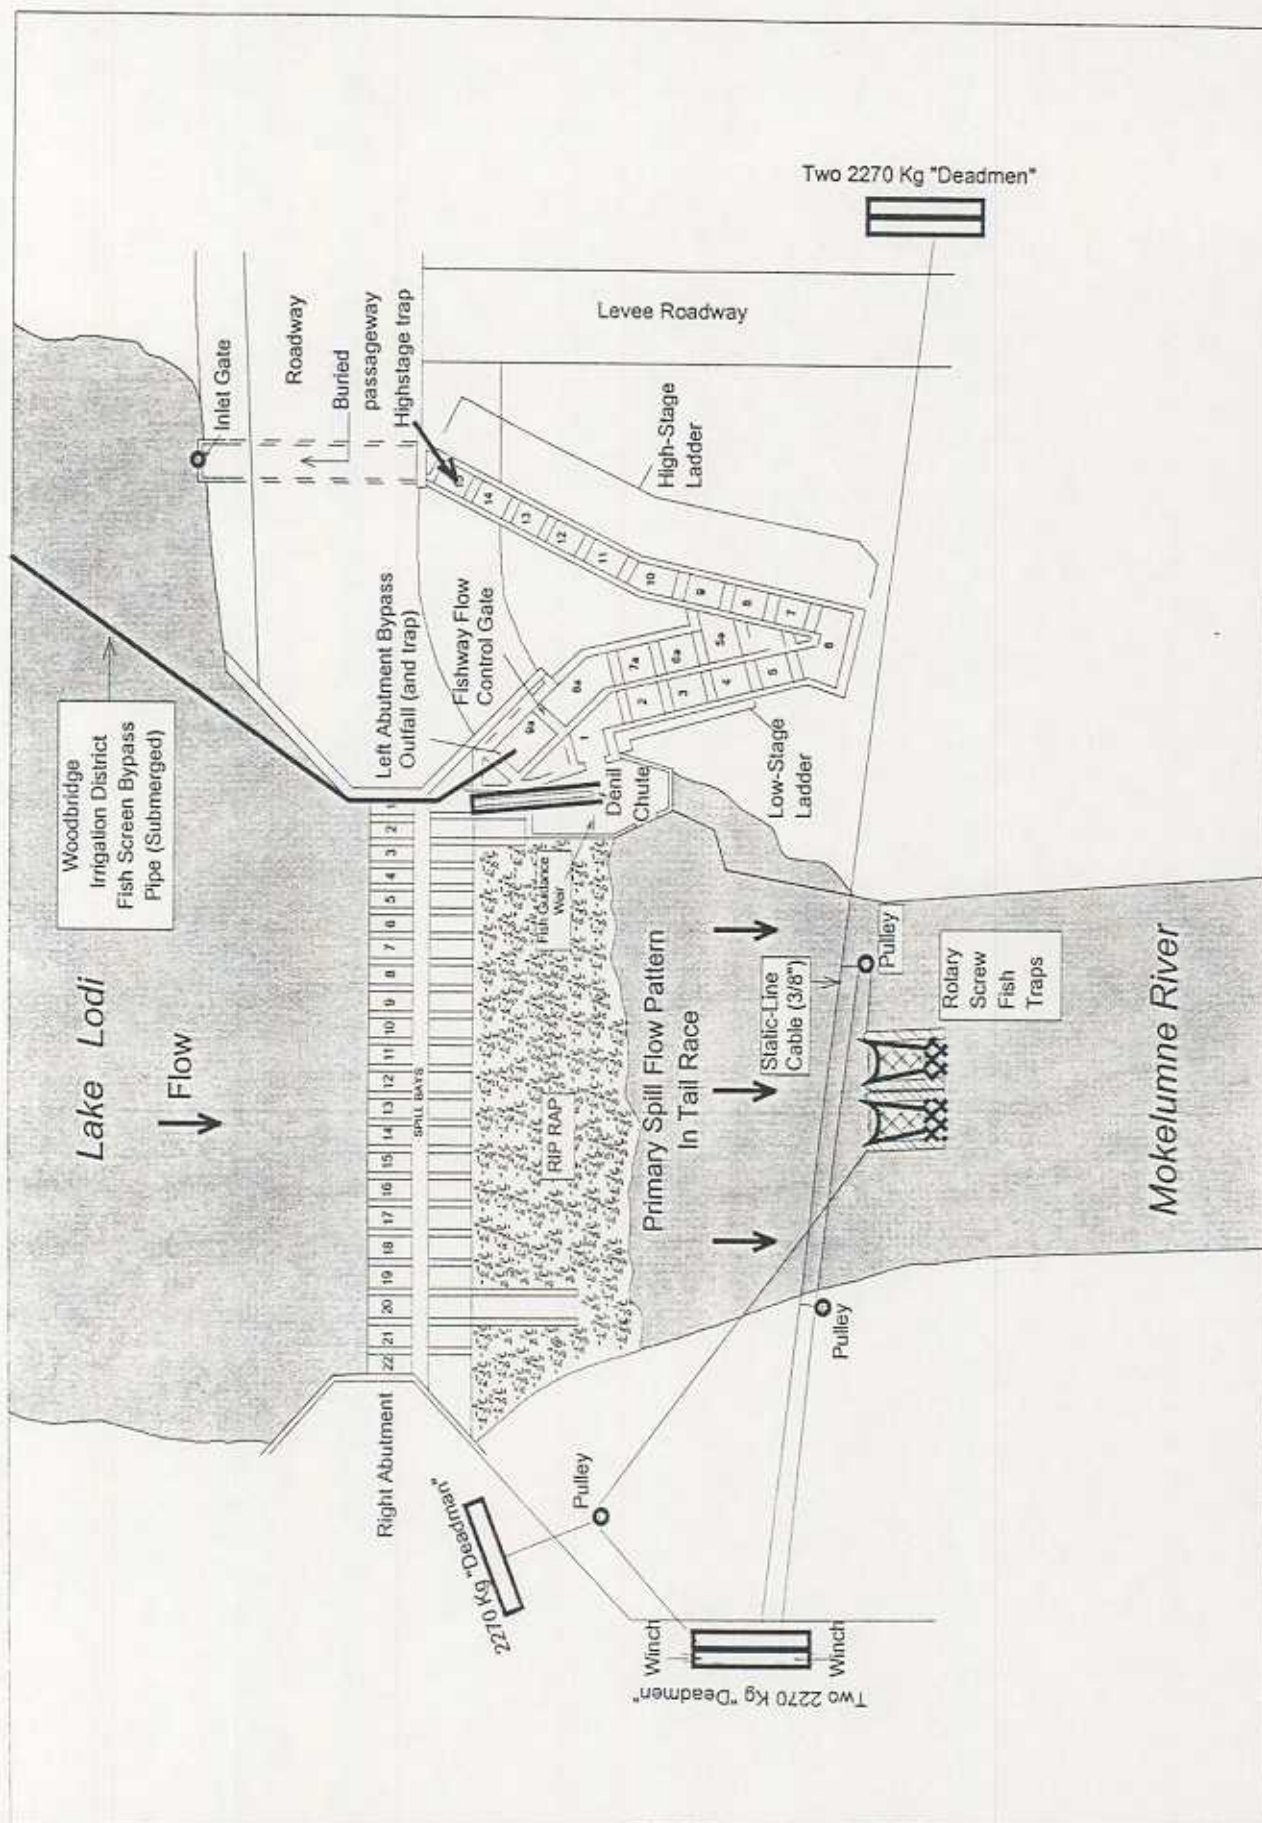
Plan view of Woodbridge Dam showing locations of downstream migrant traps employed during 1997.
